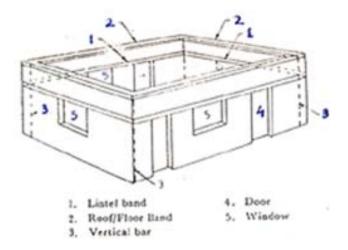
Overall Arrangement of Reinforced Masonry Buildings
